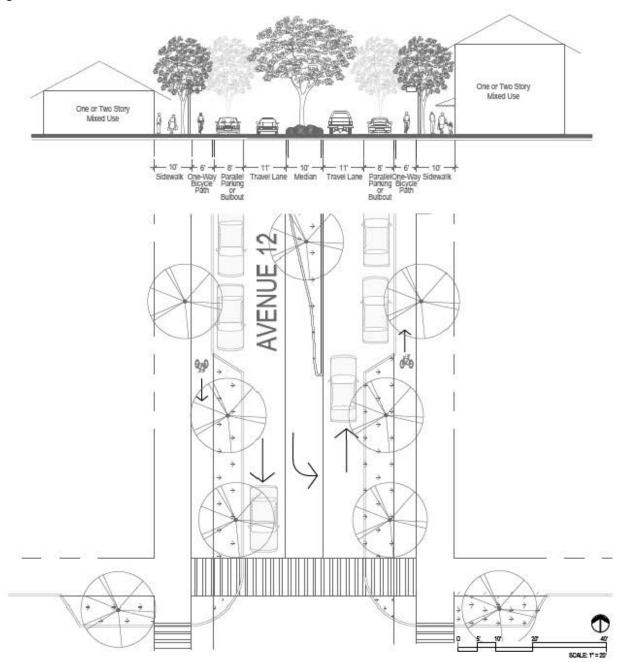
Avenue 12 Cross-Section near Downtown Area
